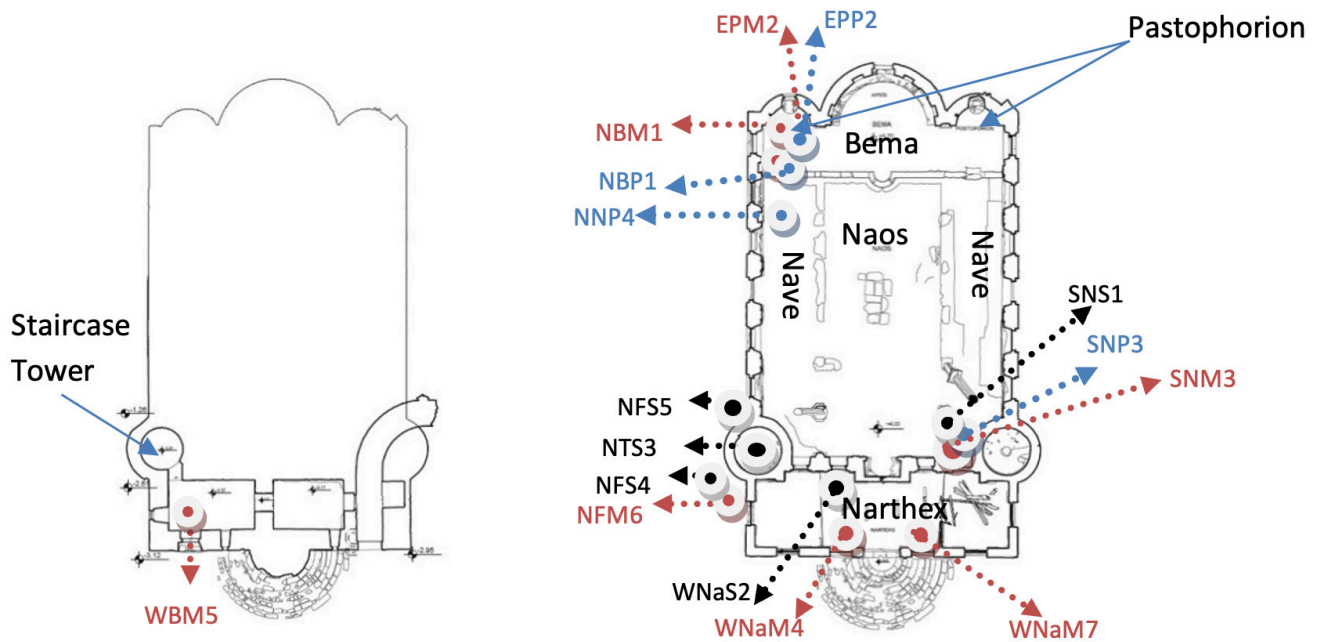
Sampling locations in basement (-1.28) and ground floor plans (+1.85)
